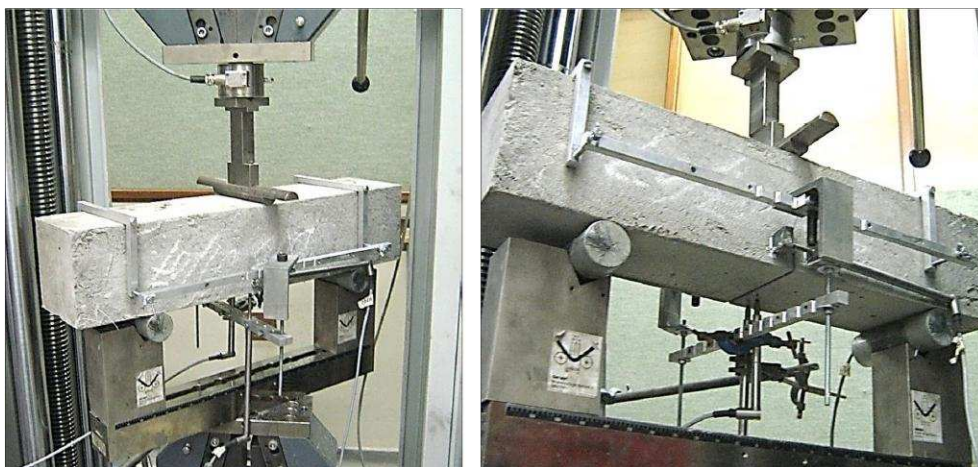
3PBT setup in Zwick Z250 Universal Material Testing Machine.
